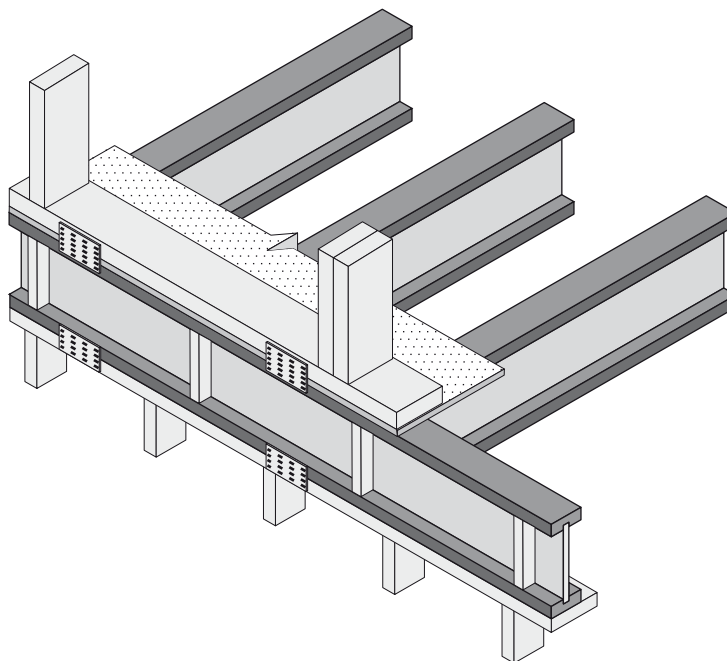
PLYWOOD LATERAL BRACING OF I-JOISTS—COMBINED BLOCKING AND RACKING LOAD TRANSFER
